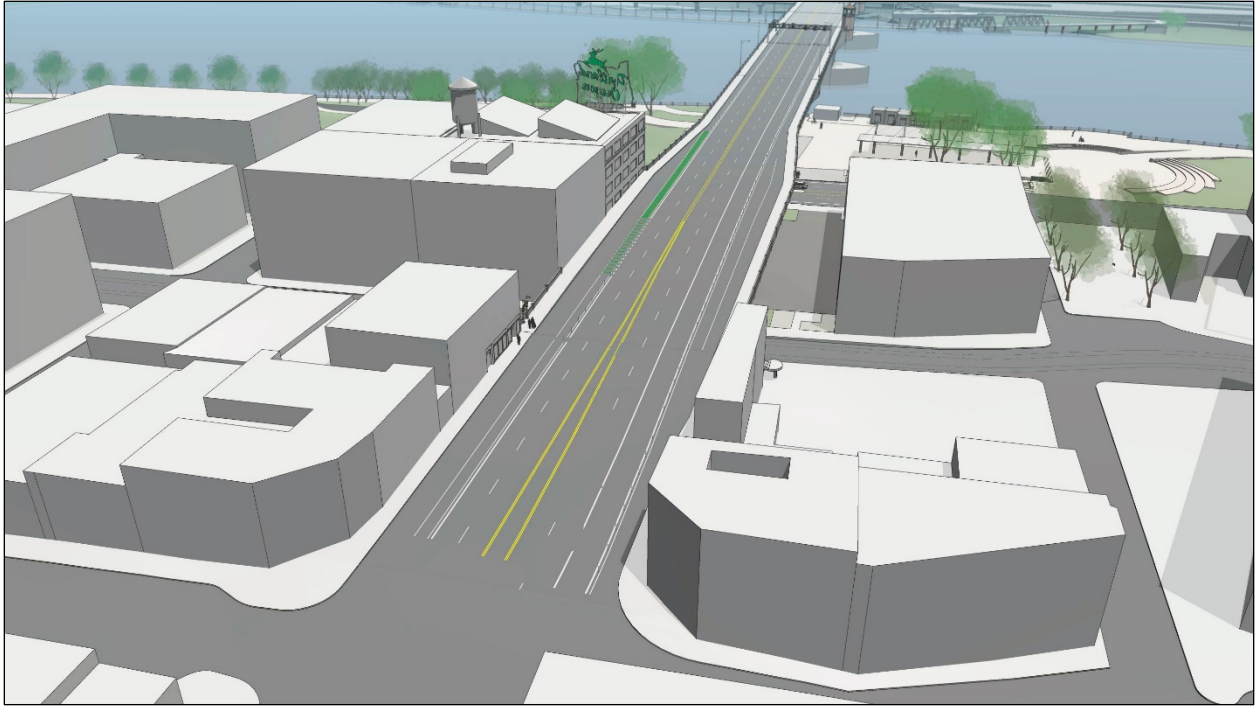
Reed Building, artist's rendering of existing condition of west approach, aerial view looking northeast (Fat Pencil Studio, 2021).
